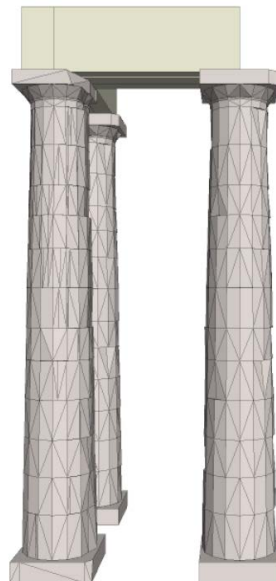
Simulation of the damaged 3-column colonnade in a corner arrangement with epistyles (architraves).
